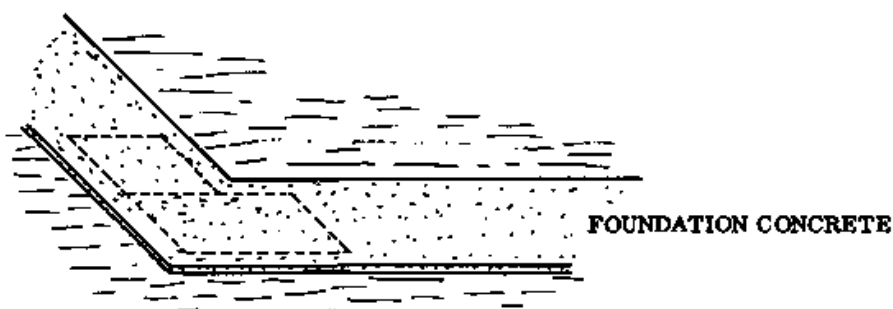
SETTING OUT THE FOOTINGS (ENLARGED DETAIL)
